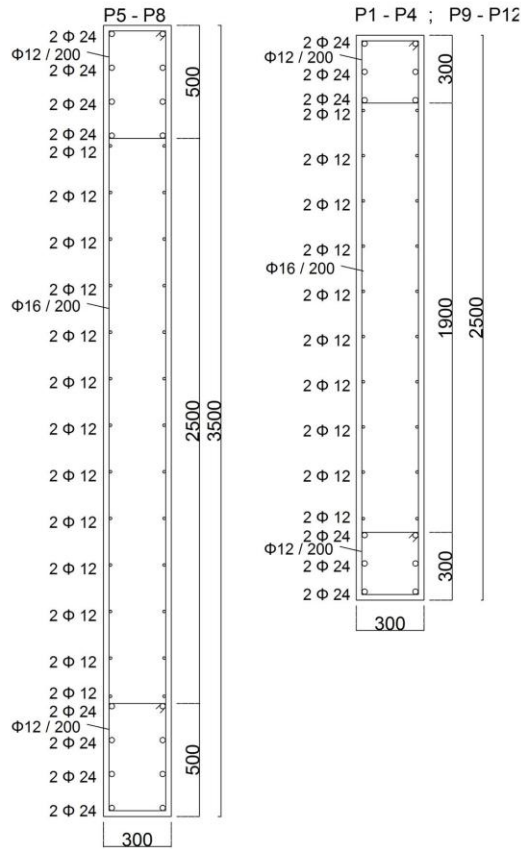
Sections and reinforcement details of shear walls outside of the critical shear wall height (H_{cr})
